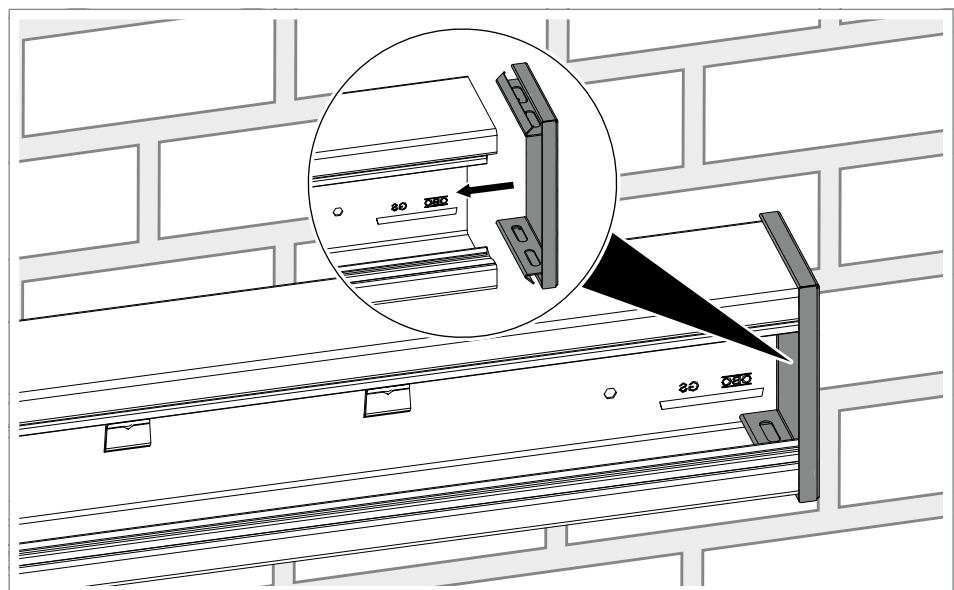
Mounting the end piece (device installation trunking Rapid 80® GS)
